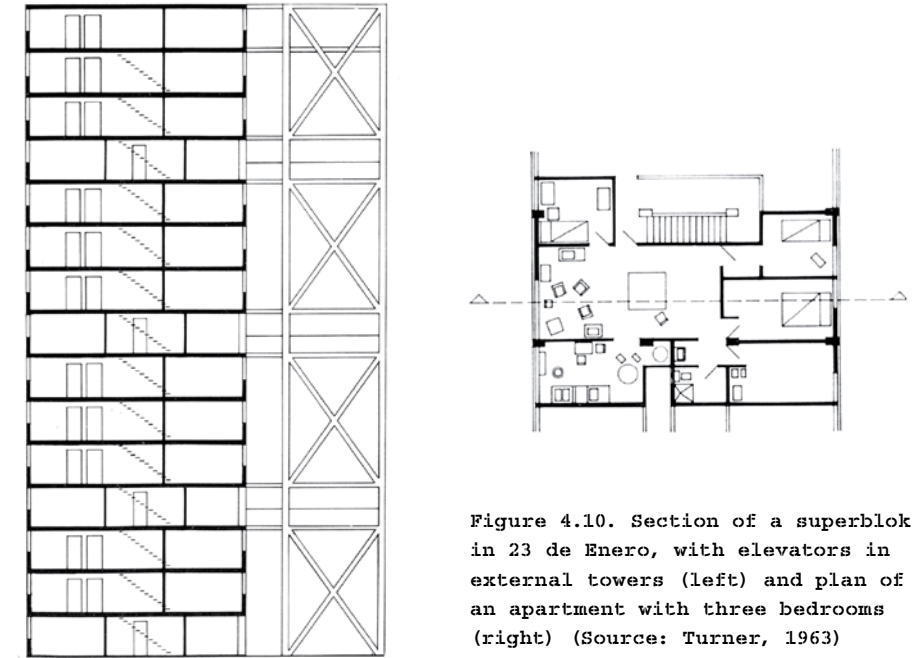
Section of a superblock in 23 de Enero, with elevators in external towers (left) and plan of an apartment with three bedrooms (right) (Source: Turner, 1963)
